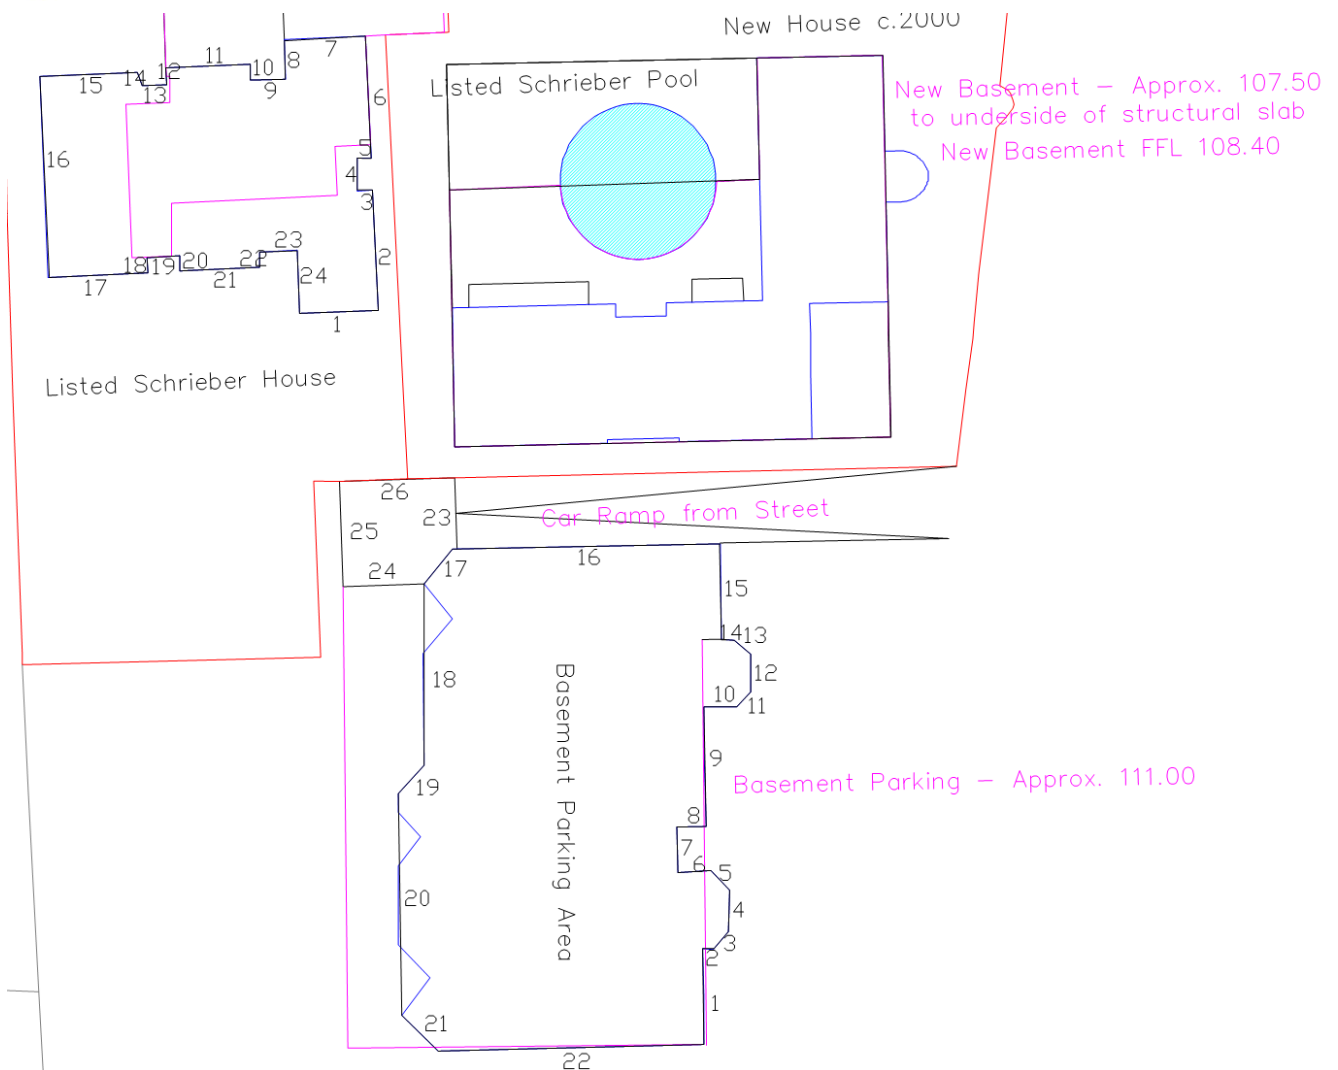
Simplified scheme and nomenclature for building façade/masonry wall elements (node/intersect reference numbers noted).
